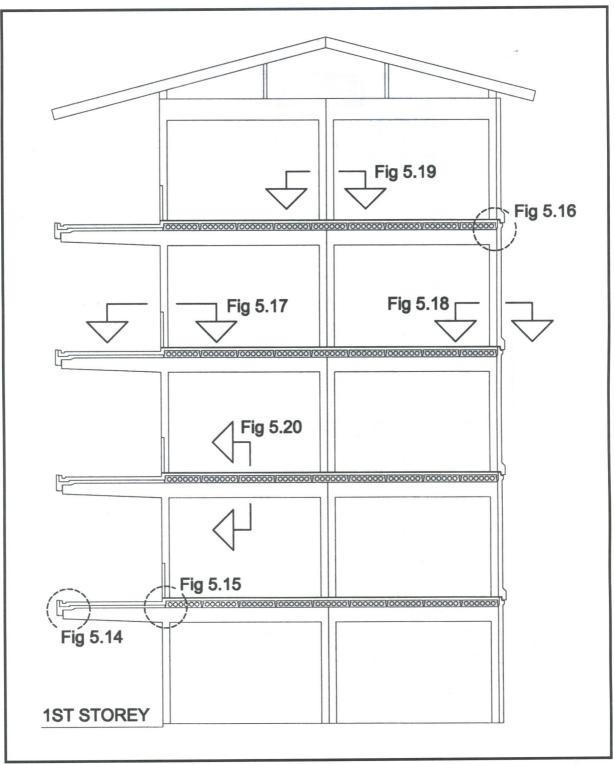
Typical Section Of A Precast Building (Section And Details To Refer To Figures 5.14 To 5.20)
